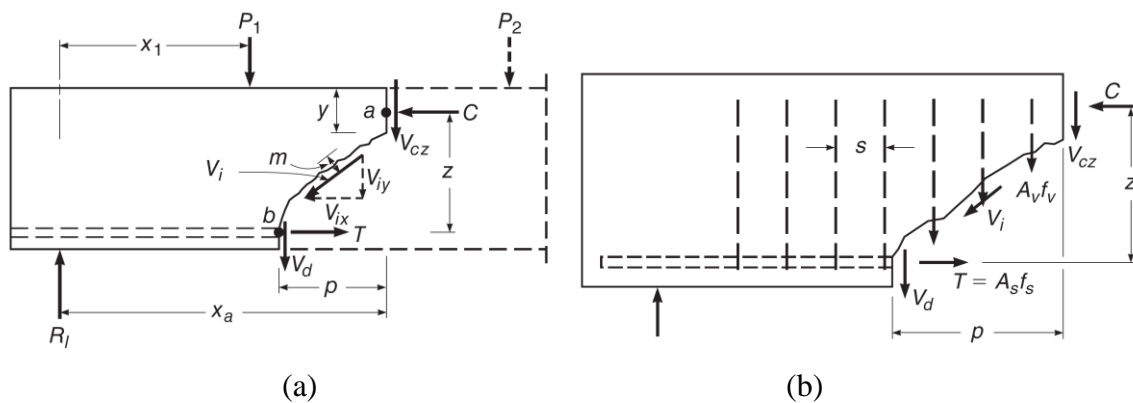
Forces at a diagonal crack in a beam: (a) without shear reinforcement and (b) with shear reinforcement (Darwin et al., 2015)
